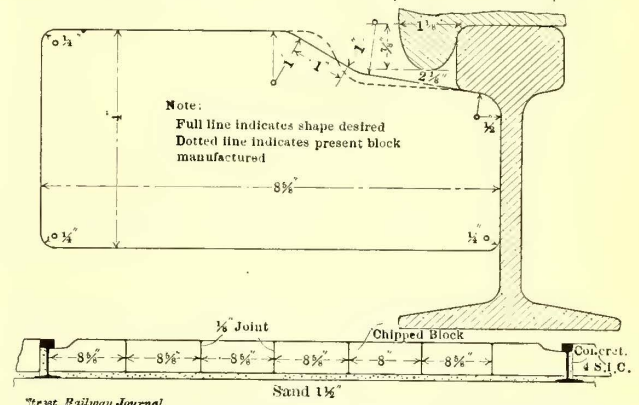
PLAN OF NOSE BRICK FOR STREET RAILWAY TRUCKS
